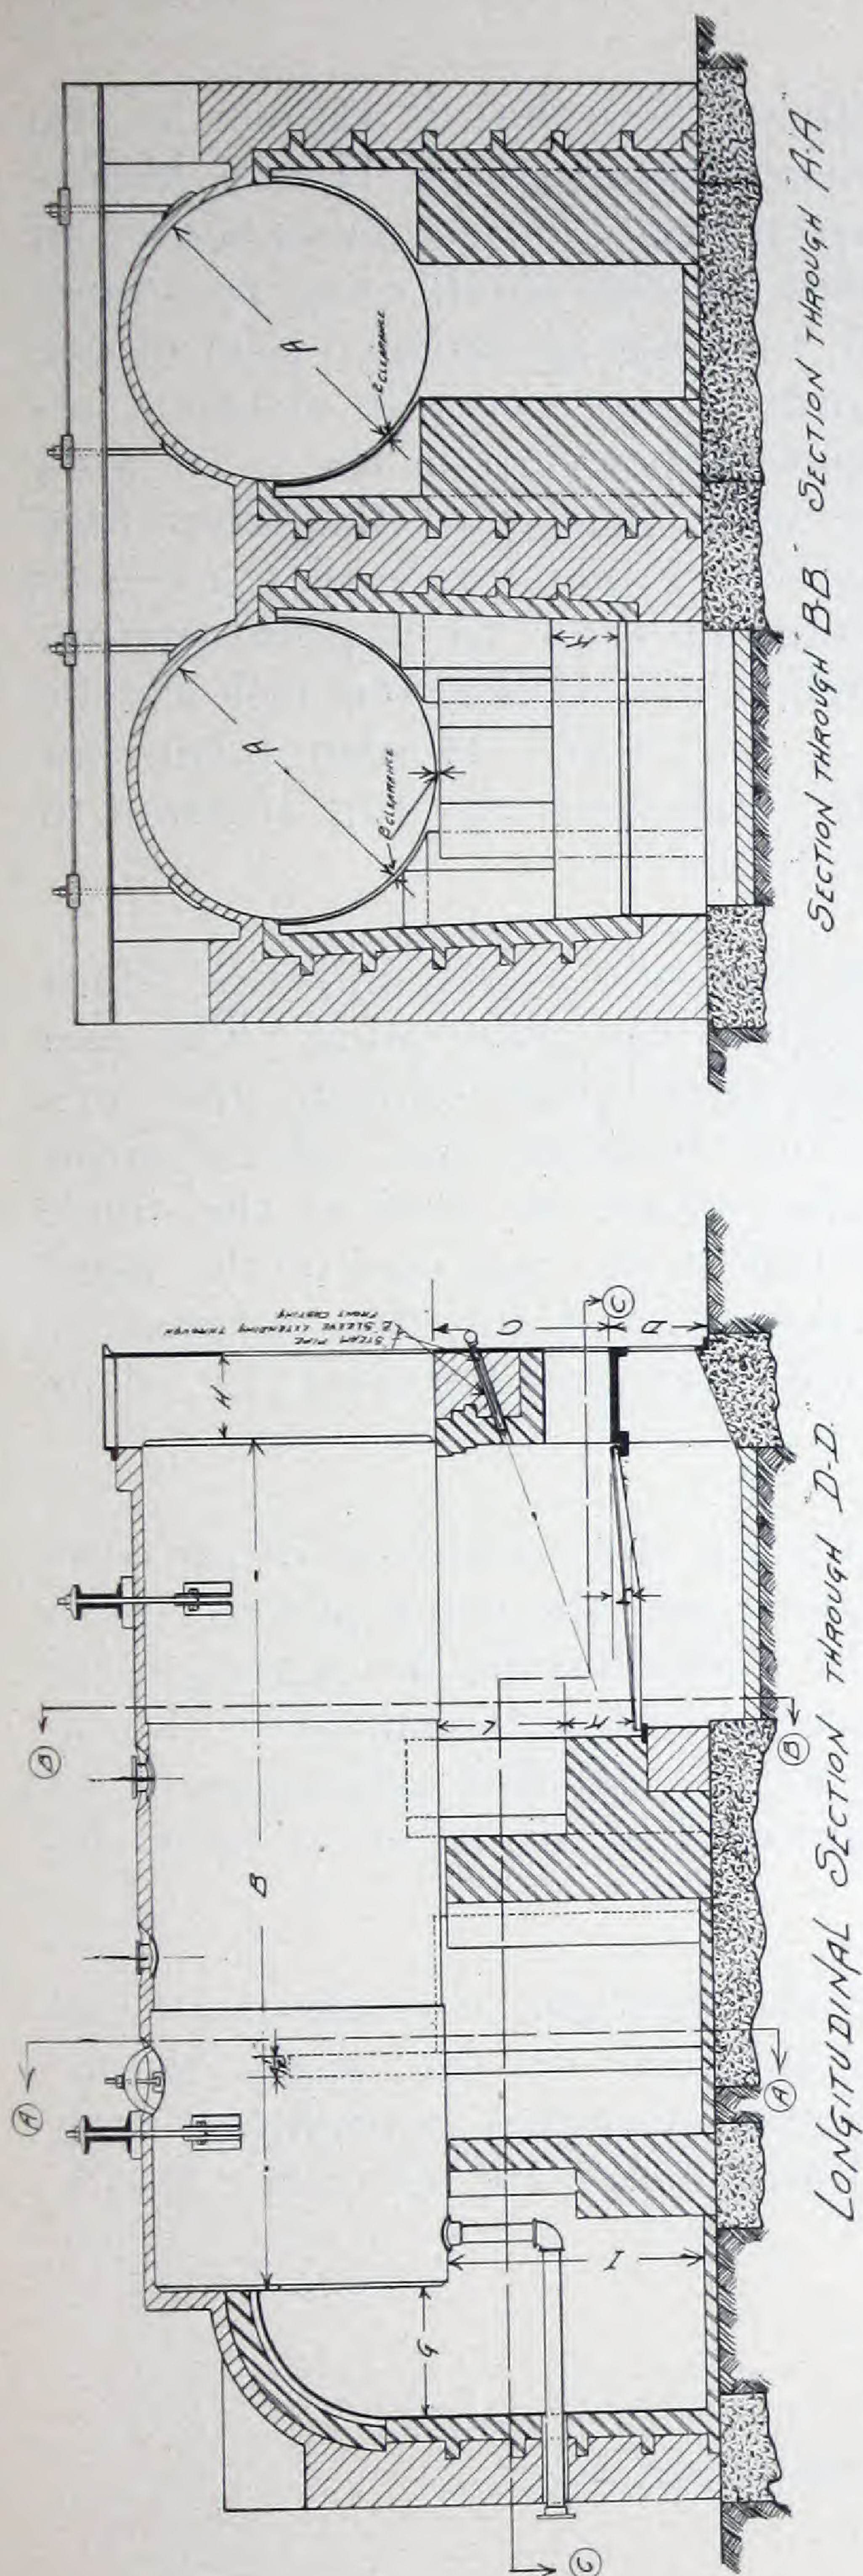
(page 25) illustrates what is known as the Department No. 8 Furnace (patented by Henry Misotow). This consists of an arrangement of piers shown in the plan section CC. There are two small wing piers built on top of the bridge wall, forming an integral part of the side walls. These piers project out a certain distance, allowing an opening of about 20 per cent of the grate area between the edge of the wing piers and the front face of the center pier. This center pier, or V pier, extends from the combustion chamber floor to a point within about 2 inches of the shell of the boiler and follows the curvature of the shell at the top. It also forms an integral part of the bridge wall from the top of same to the combustion chamber floor.
